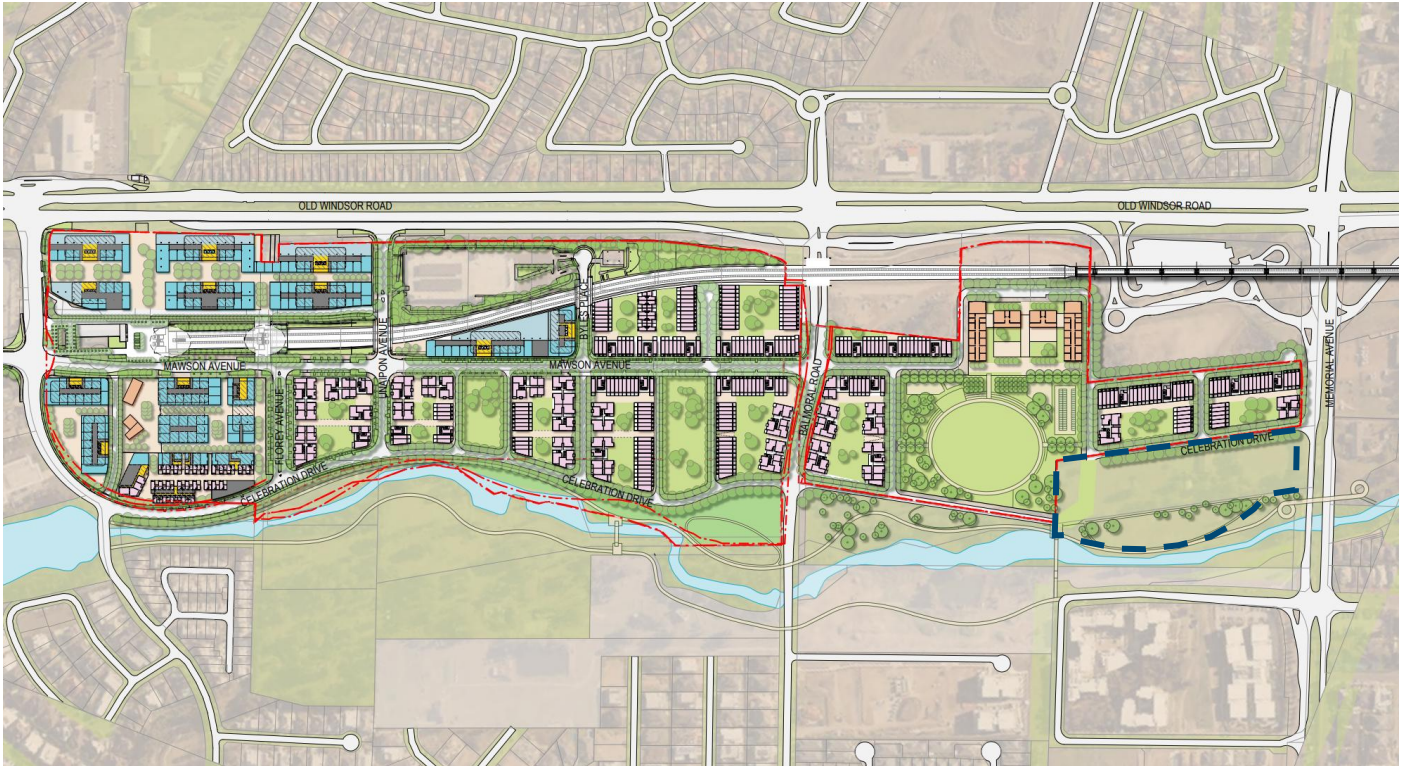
SSD10344 Mod 2 Approved Ground Floor Plan – Site Outlined in Blue (Source: Hassell)
